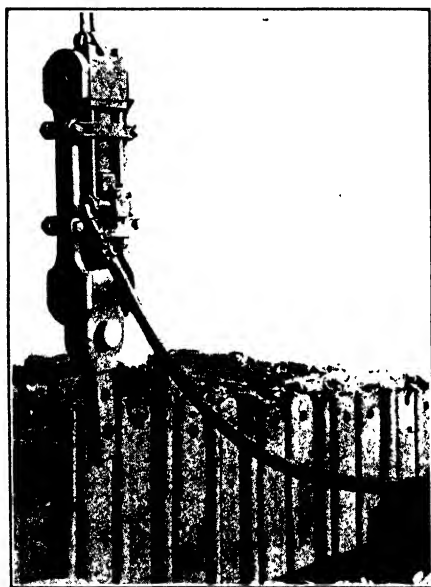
Pile Extractor Pulling Steel Sheet Piling. (Courtesy of McKiernan-Terry Corp.)
